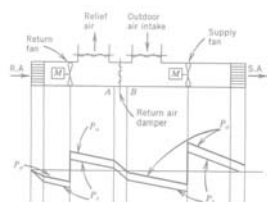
A two-fan duct system with outdoor air intake and exhaust.
